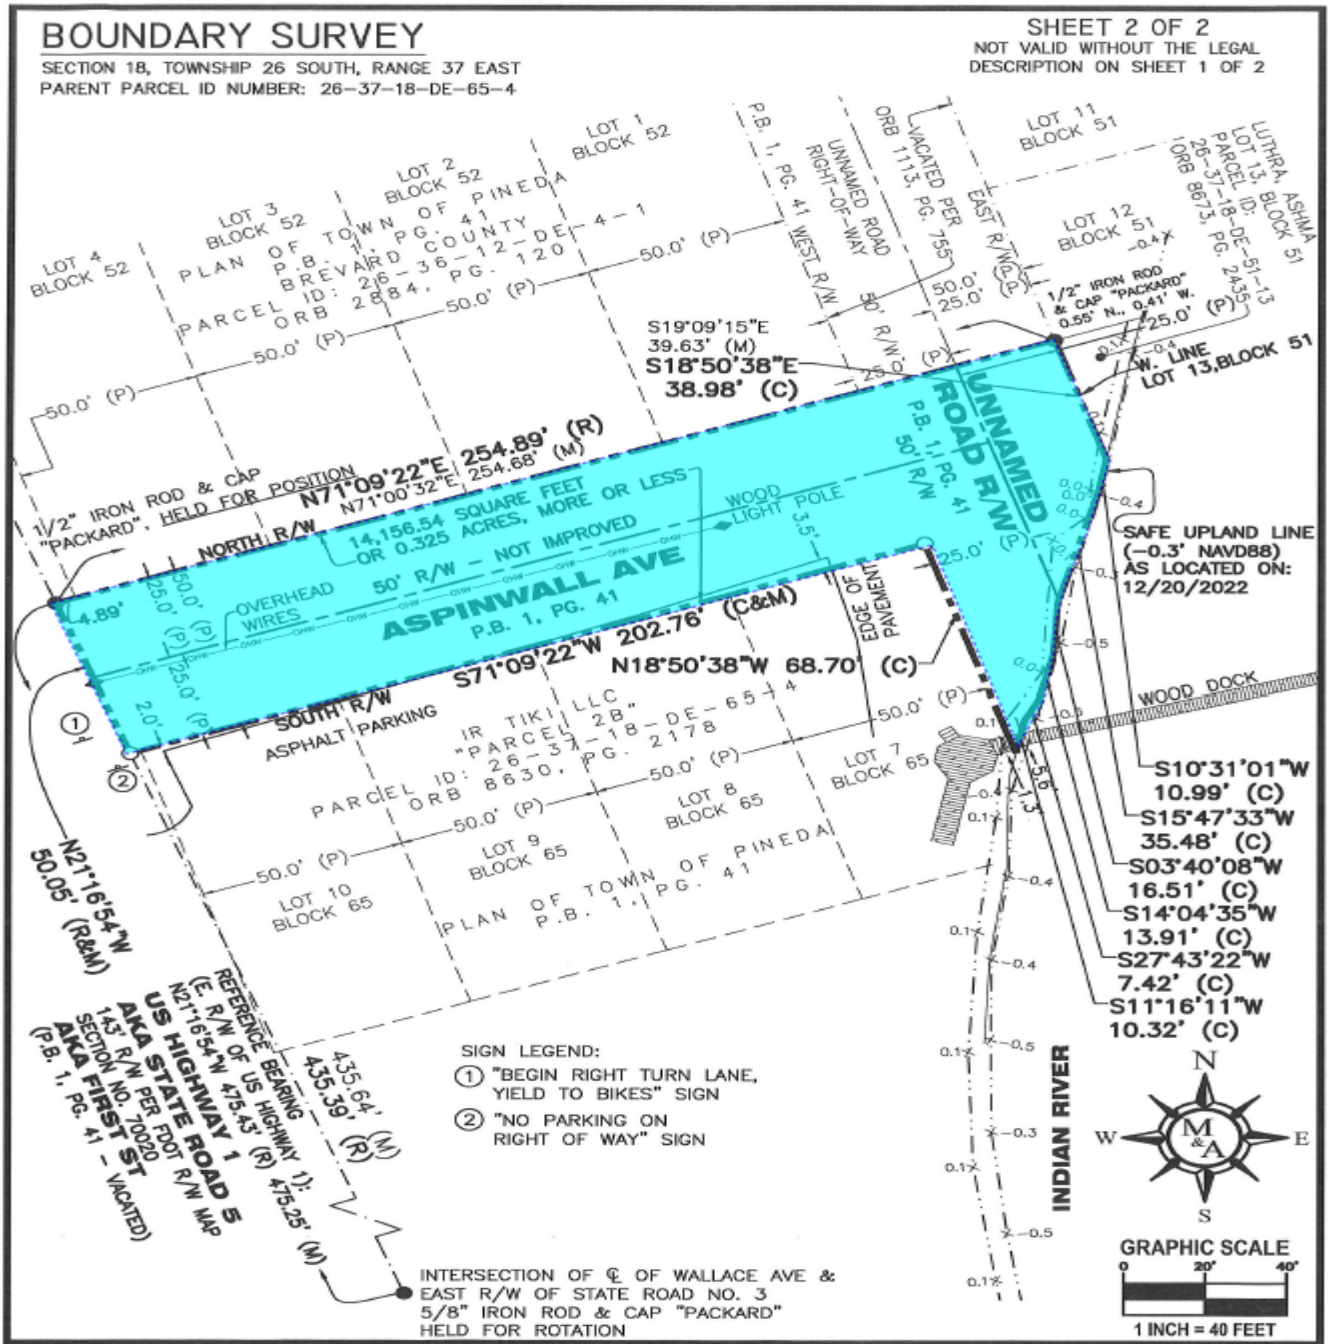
Boundary Survey. Sheet 2 of 2. Section 18, Township 26 South, Range 37 East.
